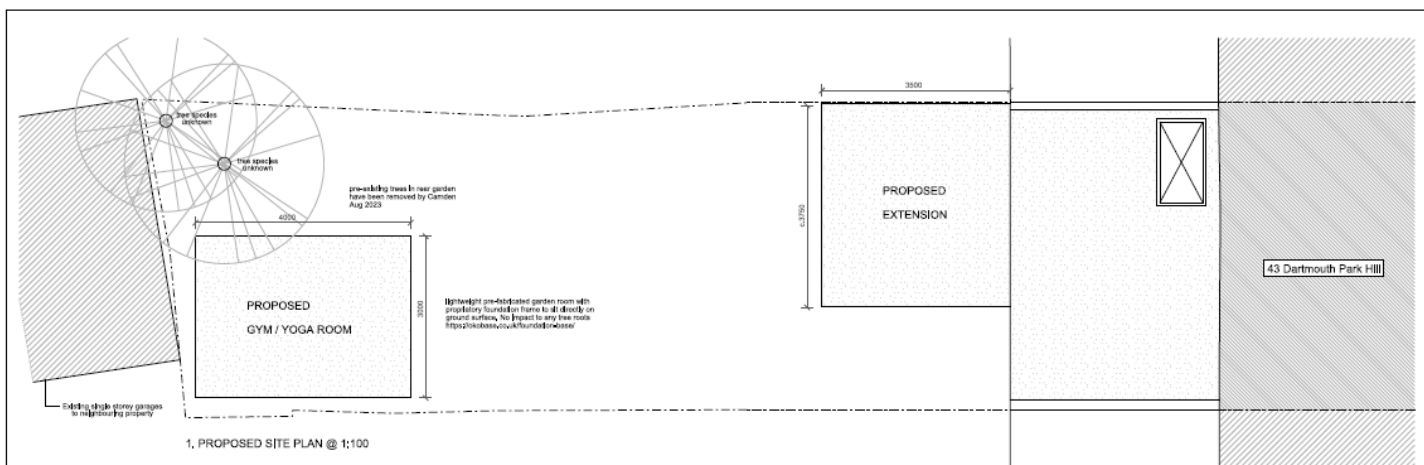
Proposed site plan showing rear extension, and outbuilding.
